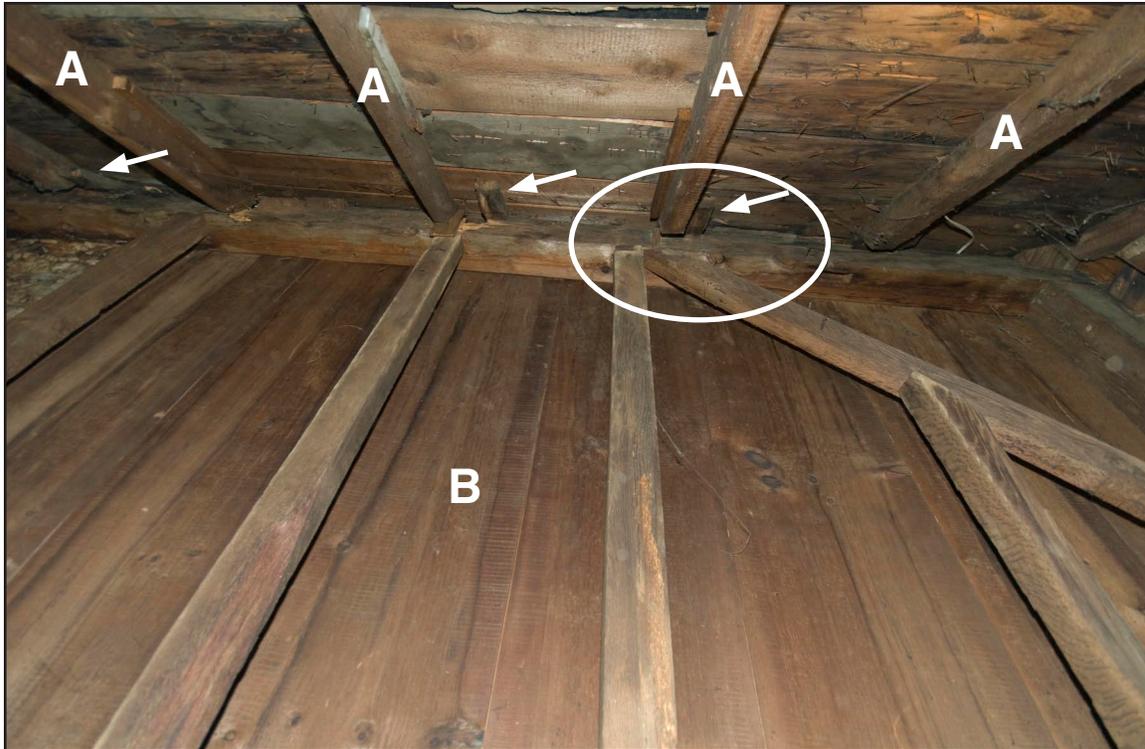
Framing of parlor chamber rear wall in leanto attic. The tails of the main roof rafters can be seen projecting over the top of the roof plate (arrows), with the separate leanto roof rafters (A) next to them. The absence of nail holes in the leanto side of the studs and plate indicates the leanto was built during the original construction of the house. The few random nails near the top of the framing were likely for hanging things. "B" marks the backside of the sheathing in the parlor closet (Room 201A).
